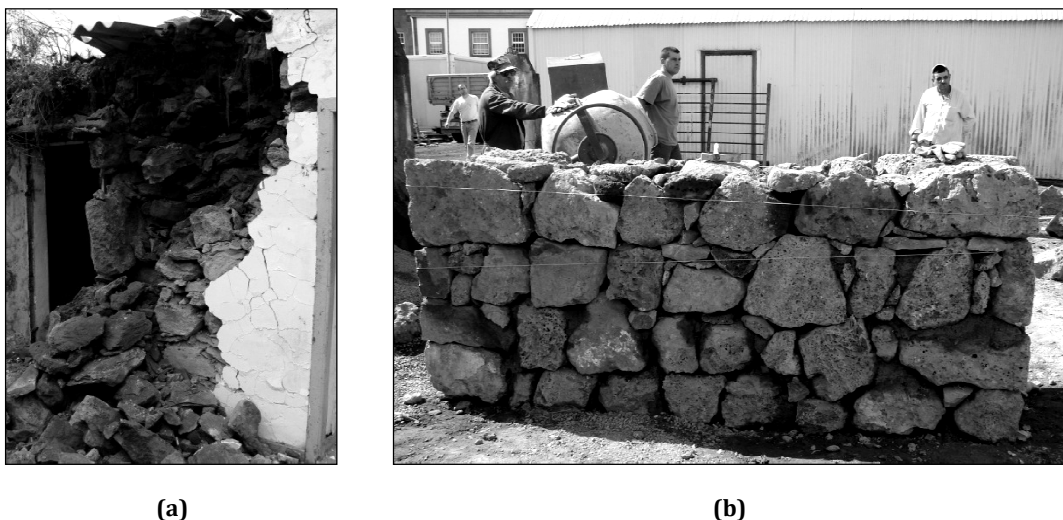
Typical double leaf stone masonry walls from Azores: a) internal constitution (existing wall); b) wall under construction
